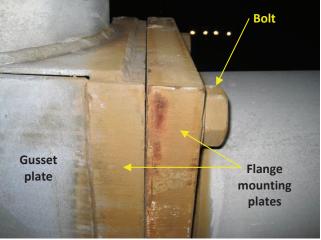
Loss of galvanization and light corrosion on flange mounting plates, bolts and washers at mast arm to pole connection
